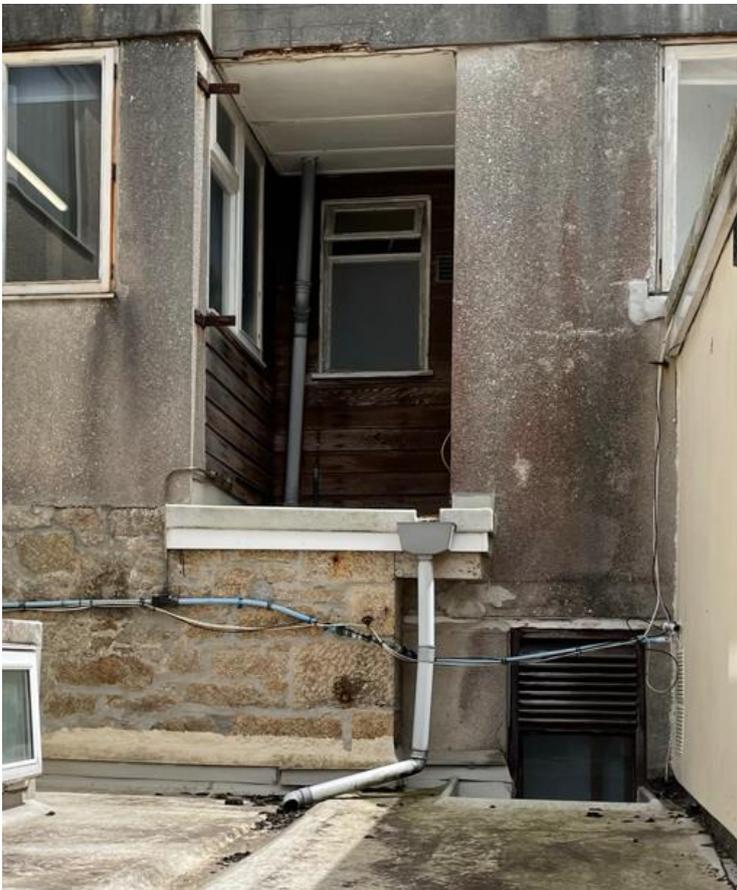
showing mansard steel on main hall wall on concrete ring beam or pad on granite and concrete T beam in the floor zone
